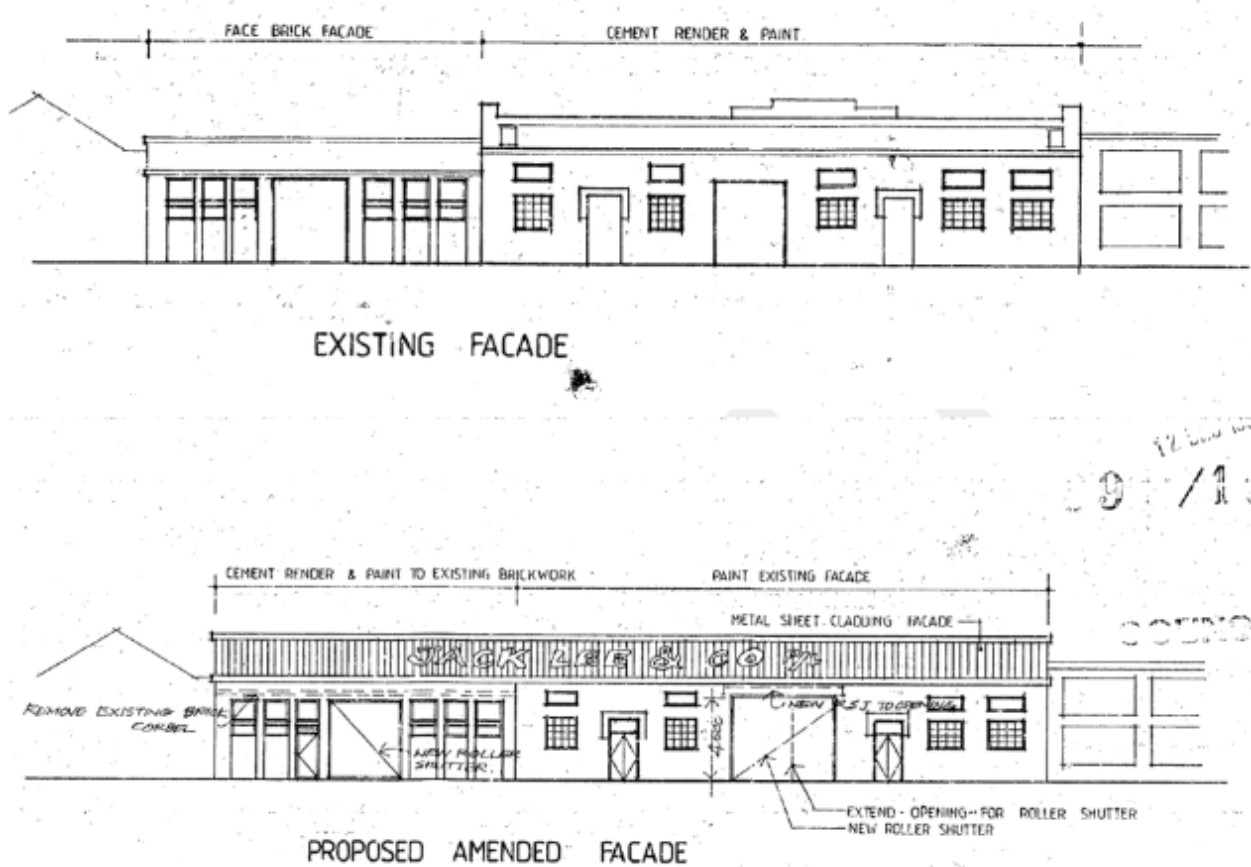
Detail from 1987 plans showing alterations to façade of subject site.
